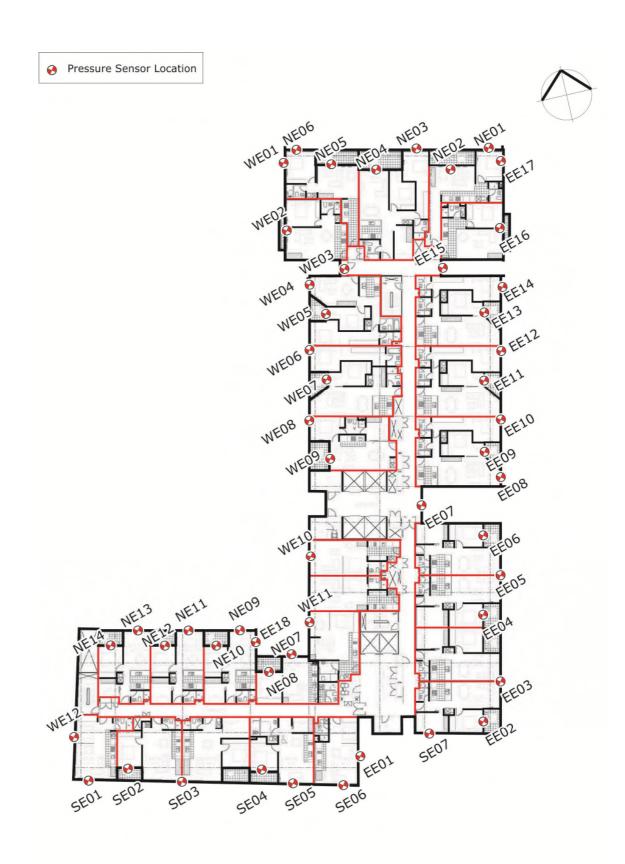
Opening Locations and Internal Apartment Layout - Level 15
